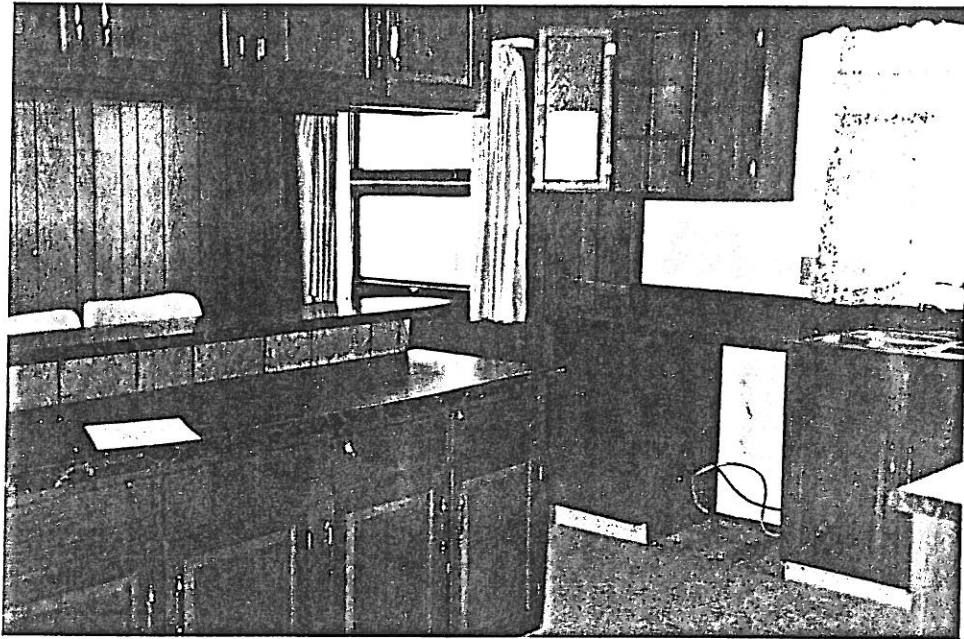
THE FIRST FLOOR KITCHEN AND DINING ROOM.
